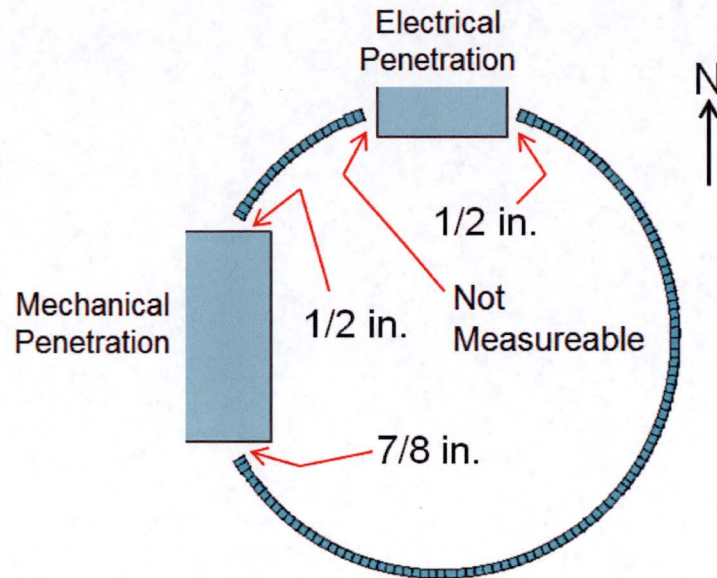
Measurements of Tangential Movement at Base of CEB Wall [2]
